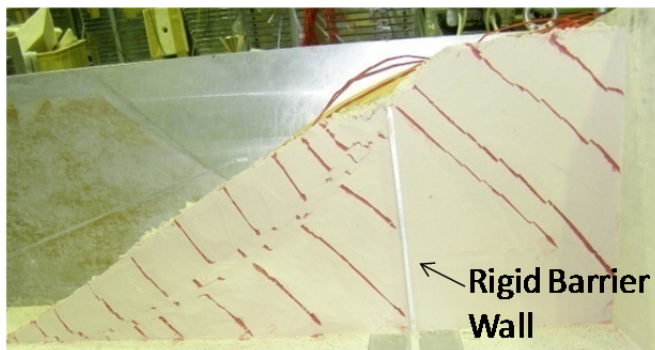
Centrifuge test on the Barrier Reinforcement Structure
